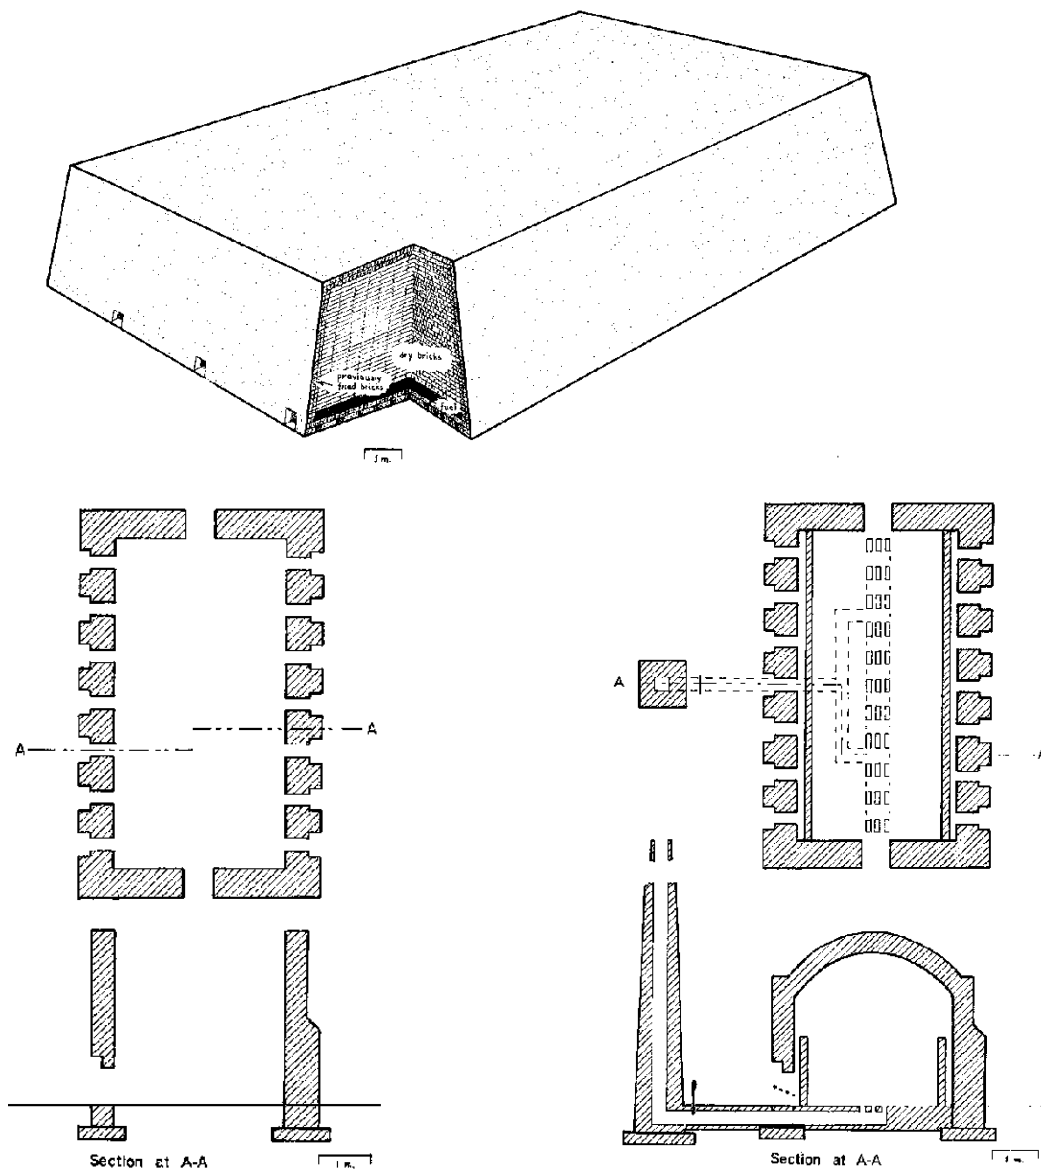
Schematic drawings of a clamp kiln (top), Scotch kiln (bottom left), and downdraught kiln (bottom right). (Source: International Labour Office, 1990)
